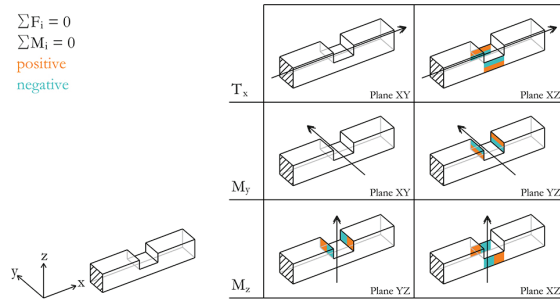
The coupling of contact surfaces responsible for transferring axial forces ensures the transfer of bending moments.
